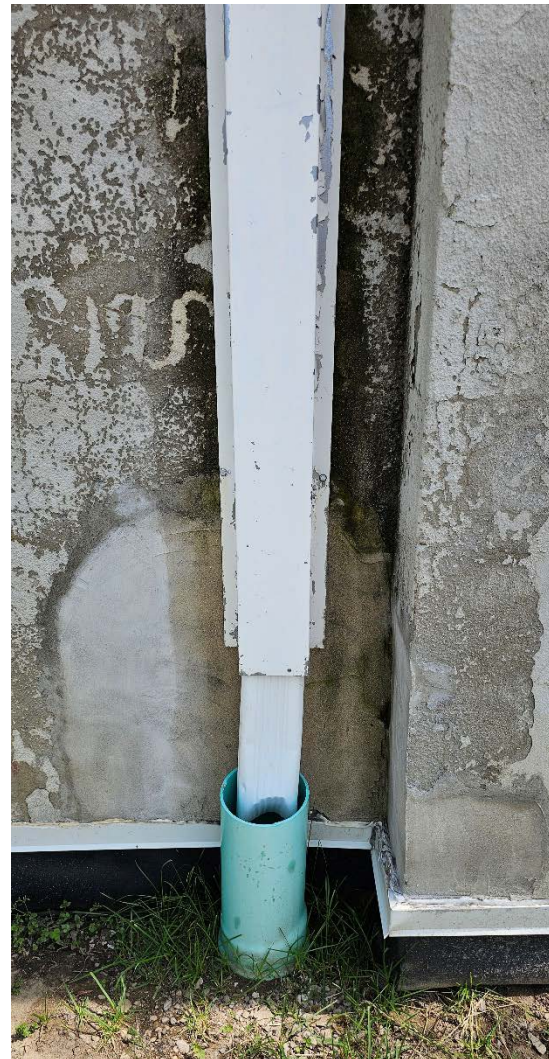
Water damage noted at rainwater leader on painted plaster walling. Image: +VG Architects
